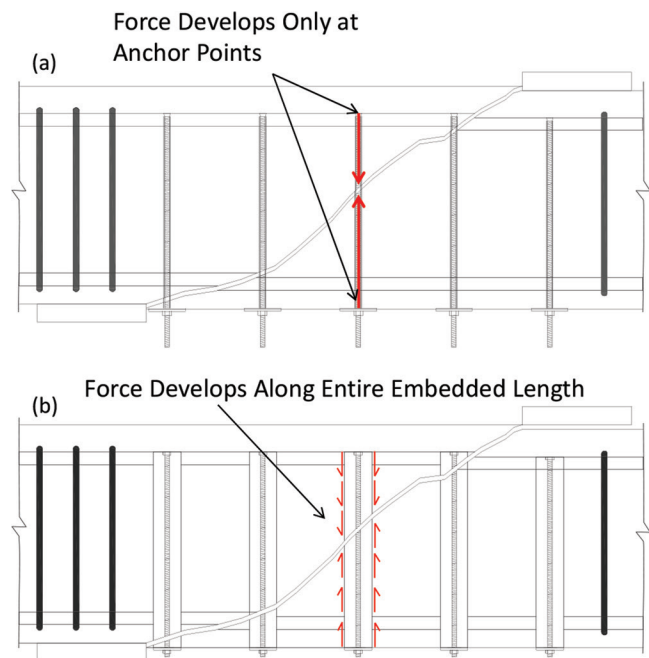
Force development for post-installed reinforcement methods: (a) undercut anchors; and (b) grouted anchors. Only the test region of specimen is shown.
